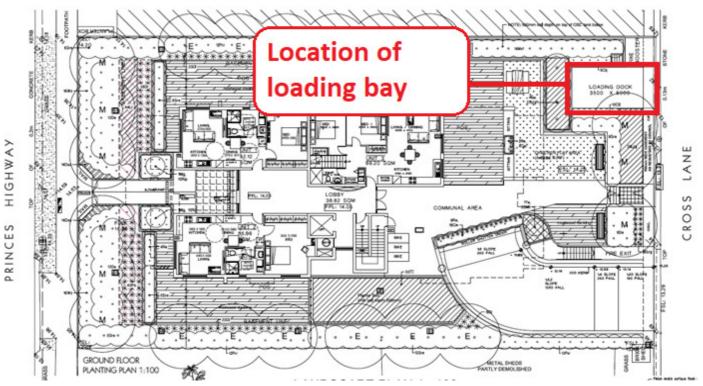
Updated Landscape Plan, illustrating the presence of Loading Dock on the northern portion of the Cross Lane frontage.
